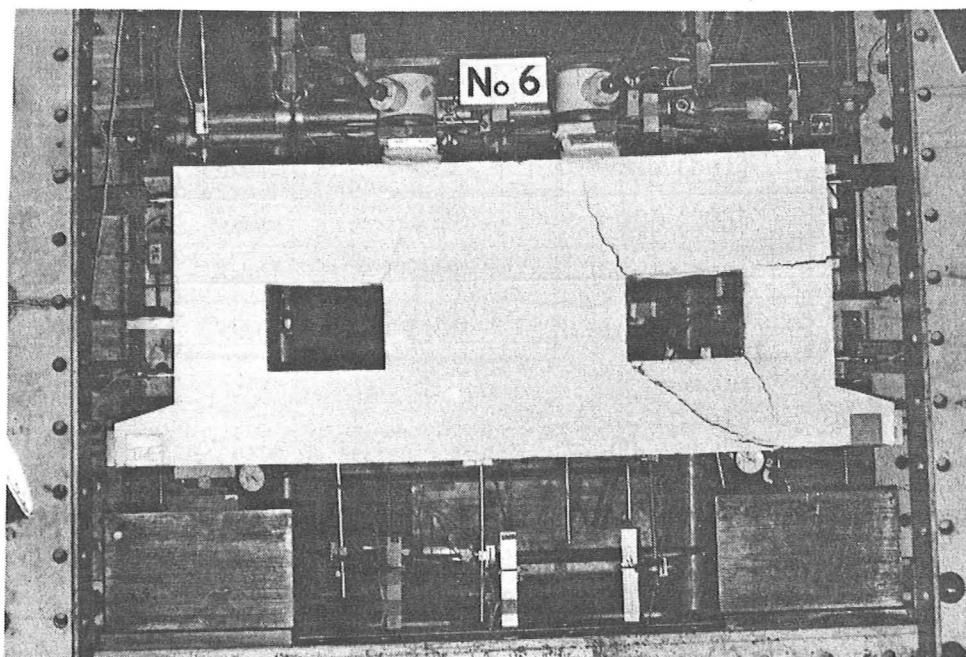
(b) Typical failure of beams with web opening and short overhang:
